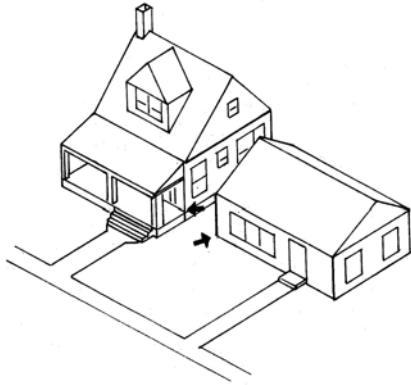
New construction should maintain typical foundation heights. The house on the right is too low.
